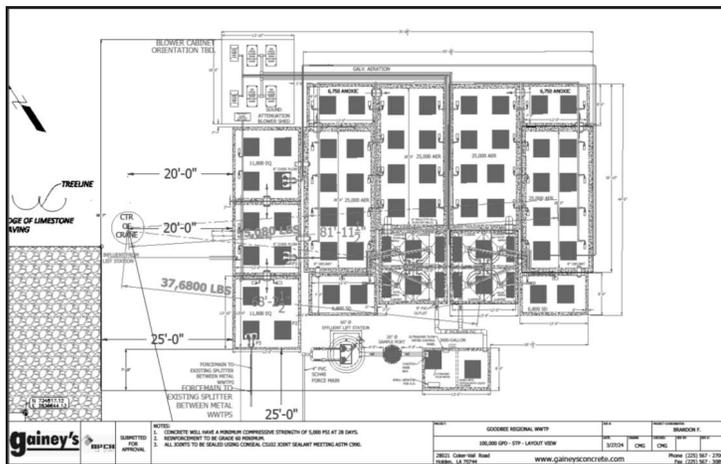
Installation plan illustrating crane positioning, lift radii, and placement of large precast tanks within the constrained site
